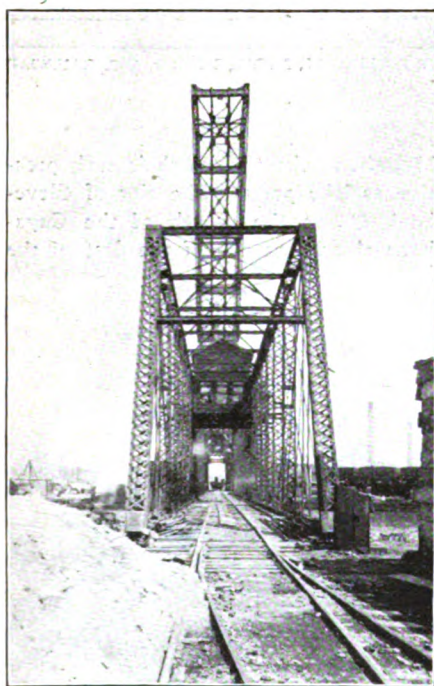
END VIEW OF NEW 230-FT. SPAN SCHERZER ROLLING LIFT BRIDGE FOR B. & O. RAILROAD AT CLEVELAND, SHOWING MAINTENANCE OF TRAFFIC DURING CONSTRUCTION.
